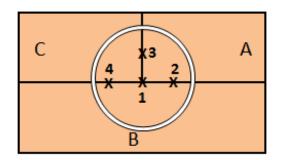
Assembled Laminate Planks with Plastic Ring seal
